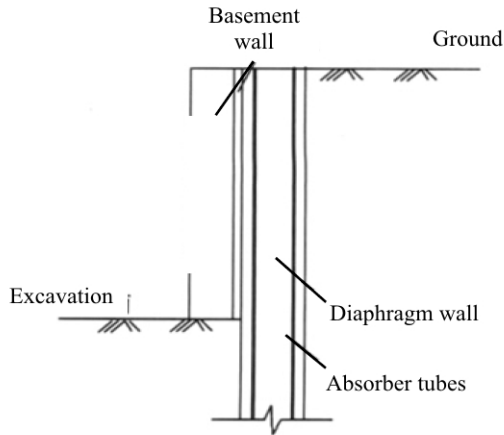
Skeleton of the geothermal heat exchanger embedded in a cantilevered diaphragm wall.
